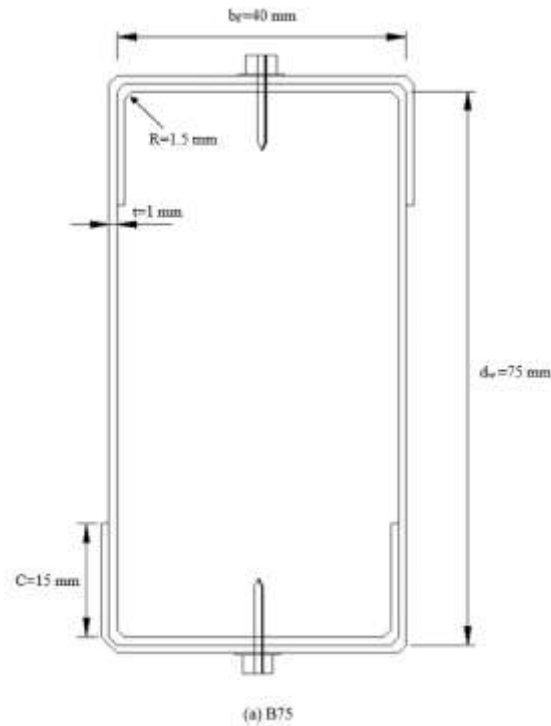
Geometrical Cross Section of a Single Box Section [8]
